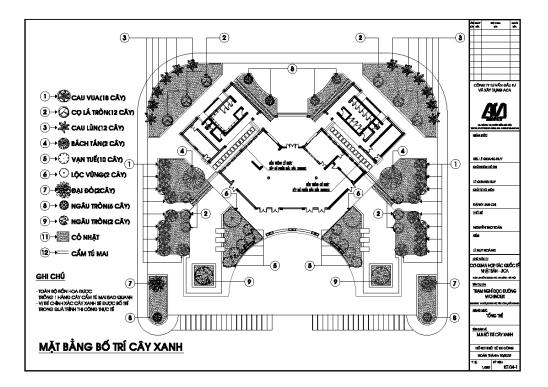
Plantation Plan for Michinoeki Pilot Project as Prototype Design Source: JICA Study Team
